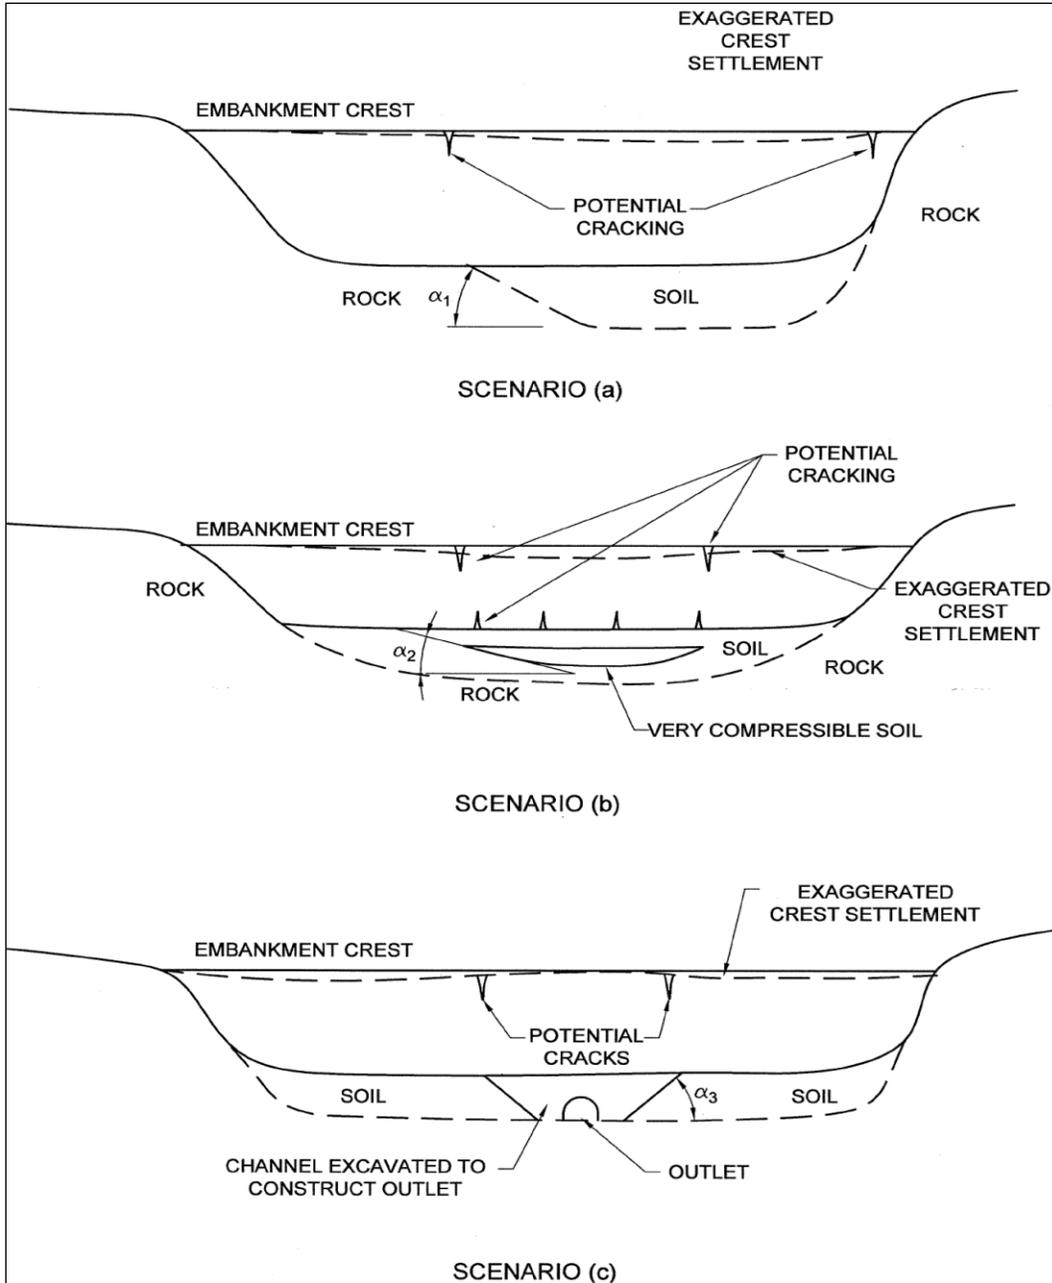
C-5.—Cracking and hydraulic fracture due to differential settlement in the foundation (Fell et al. 2008).
